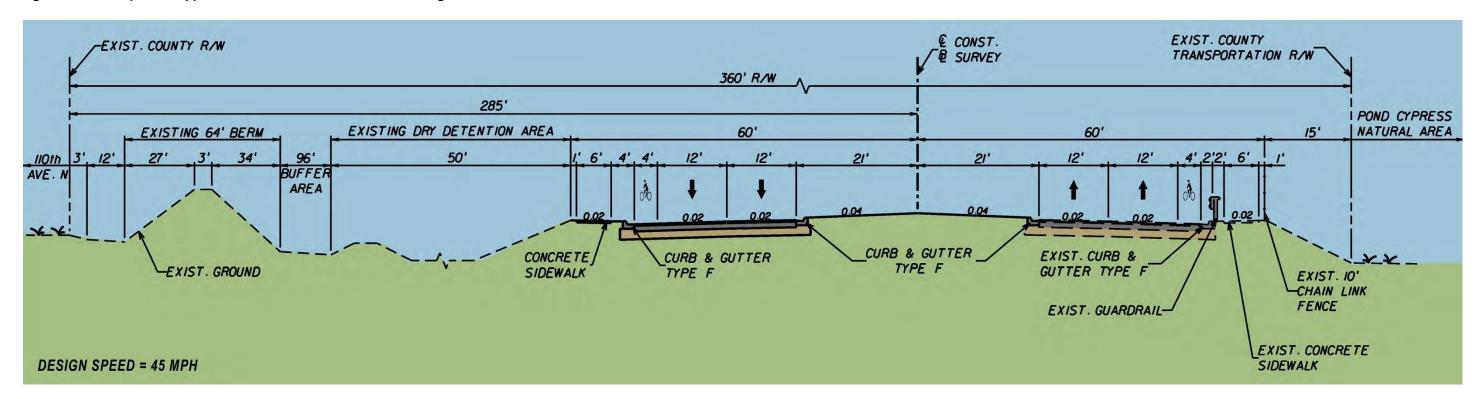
Proposed Typical Section-Parallel to the Acreage
